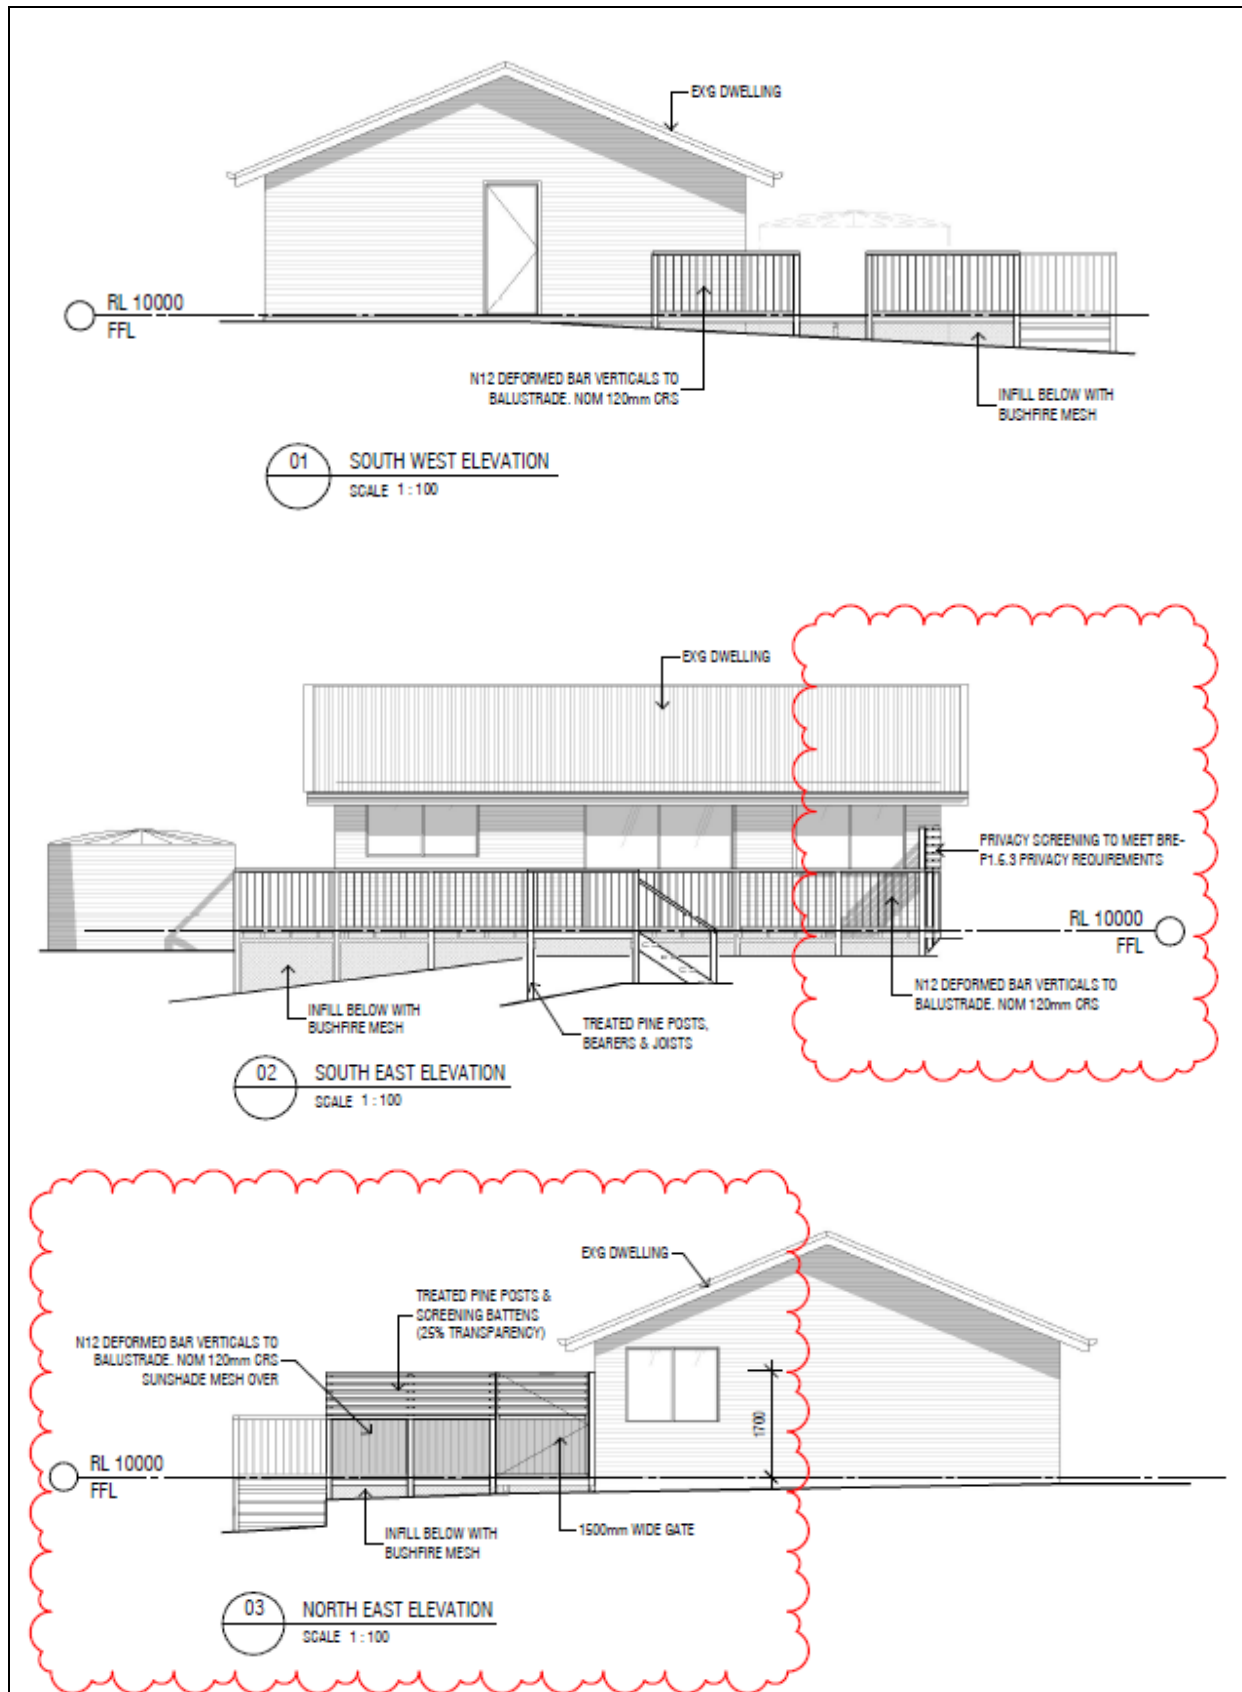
Elevation Plans – Existing Deck (Source: Edwards + Simpson).
